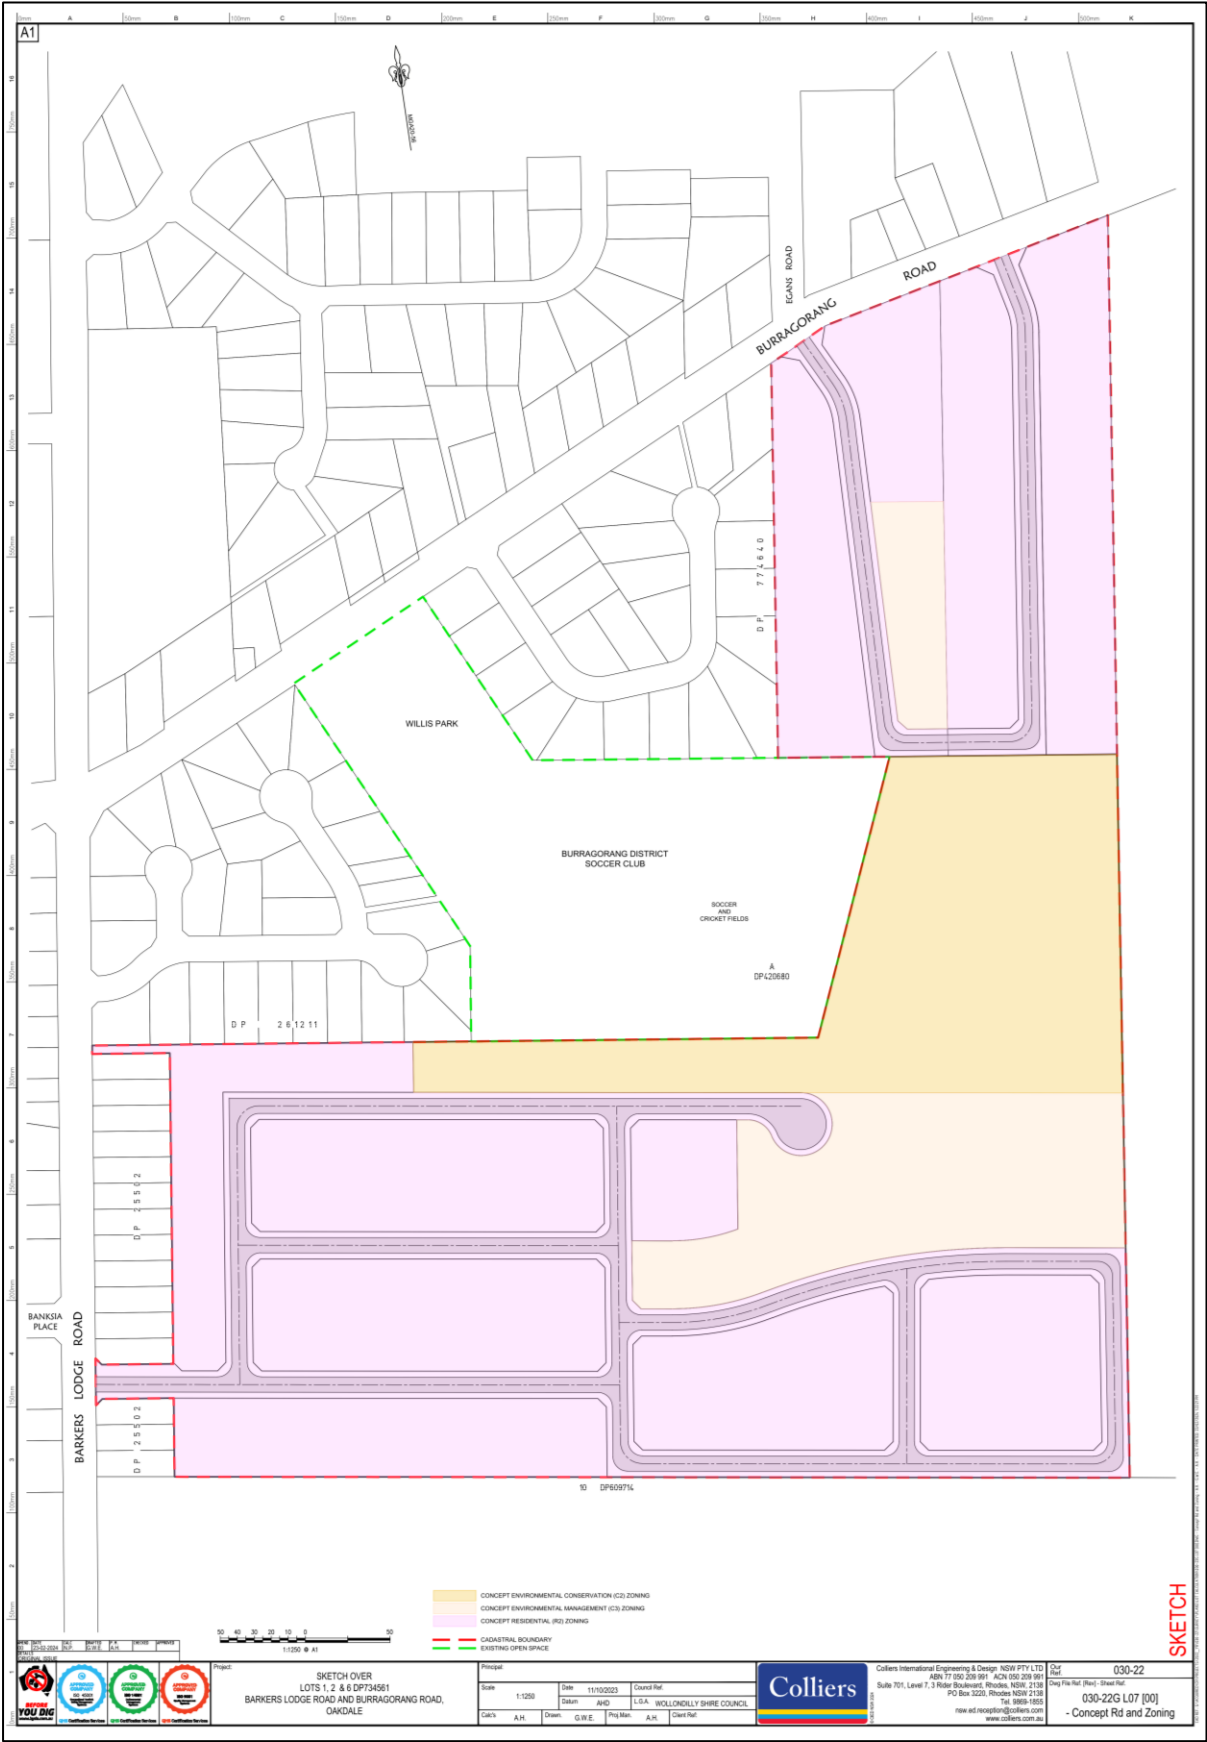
Proposed zoning overlay subdivision layout plan (Source: CED, 2024)
